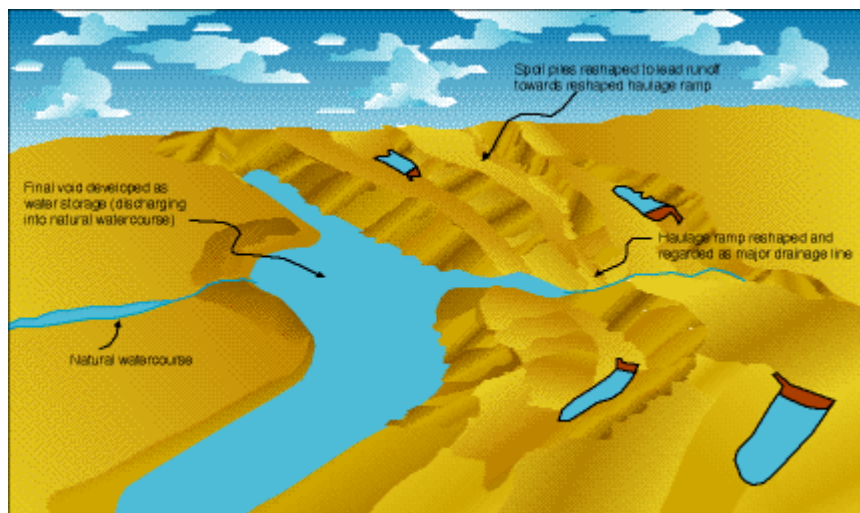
Reshaping of Strip-mine Spoil Piles for Drainage Towards a Final Void (after Hannan, 1995)
